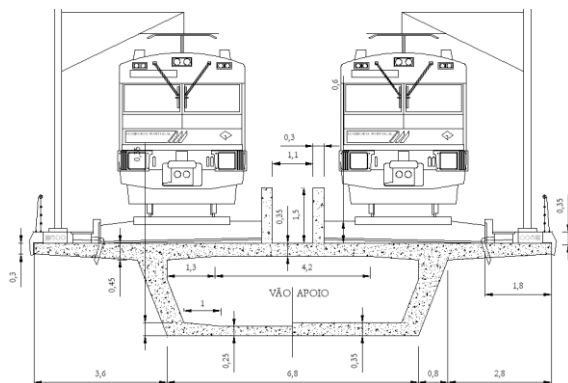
Reinforced concrete deck in the span and support deck sections
